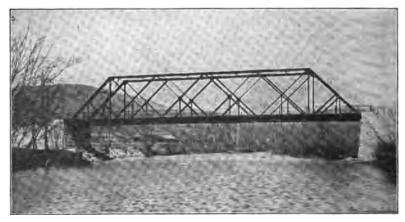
Through Riveted Quadrangular Warren Truss, Built by Boston Bridge Works.
